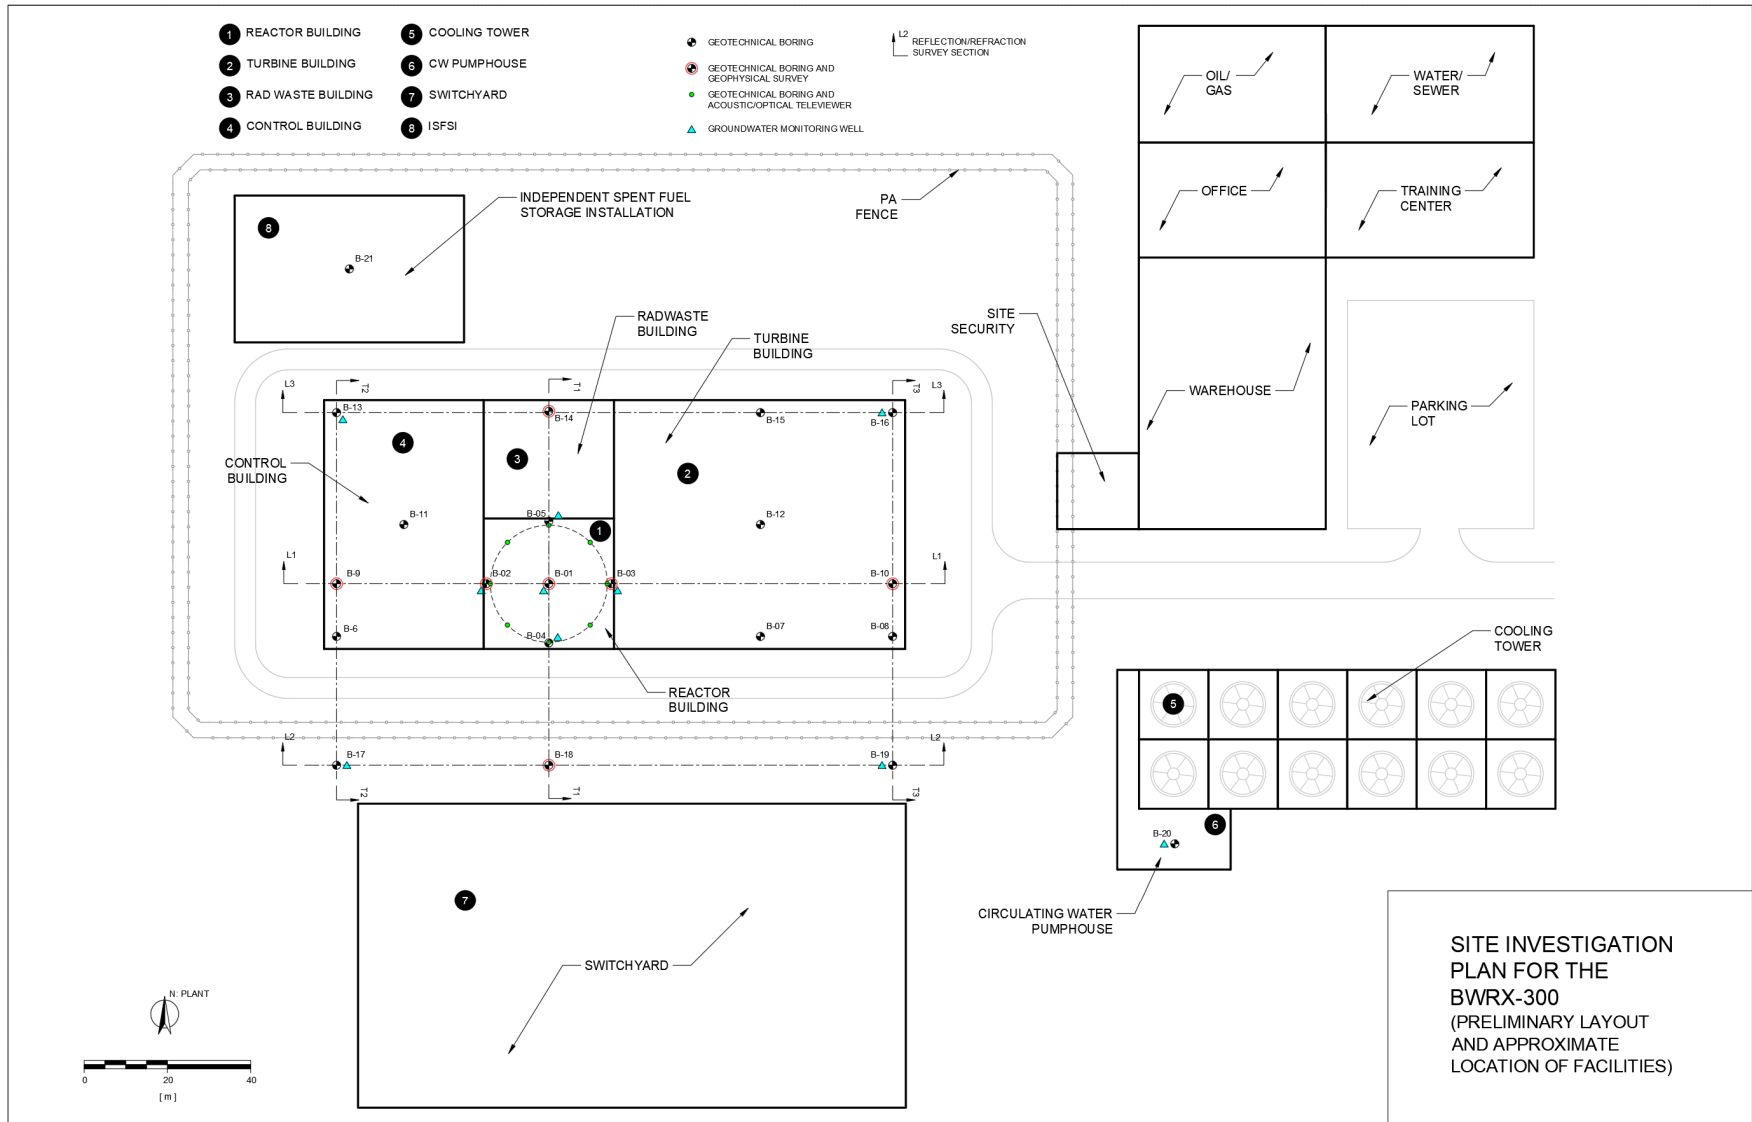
Preliminary Layout of the BWRX-300 Borings
